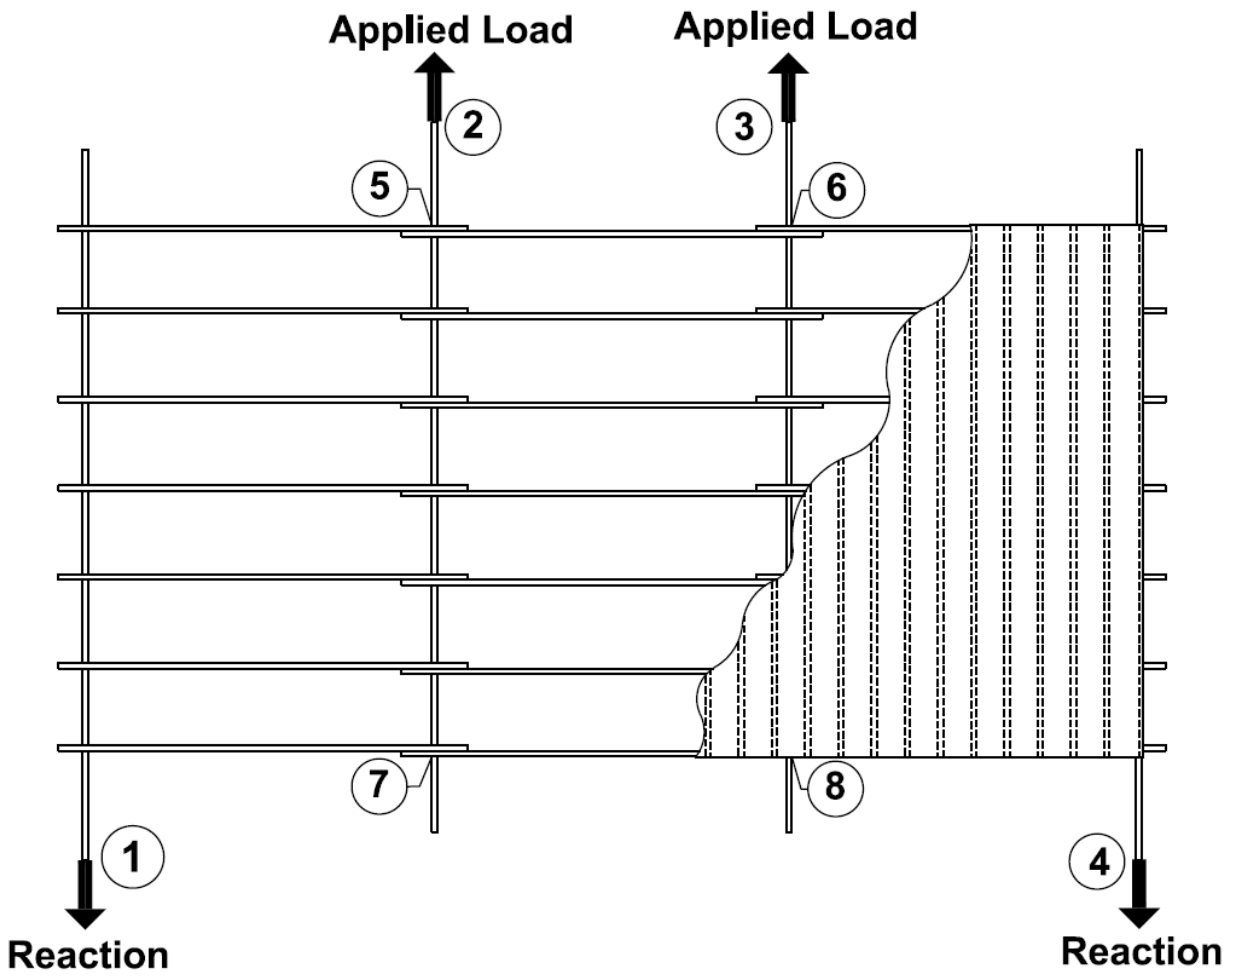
Location of string potentiometers for simple beam diaphragm test
